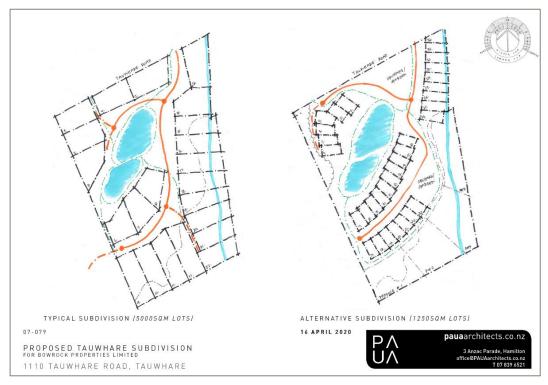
Potential Subdivision Layouts (Source: Paua Architects)
